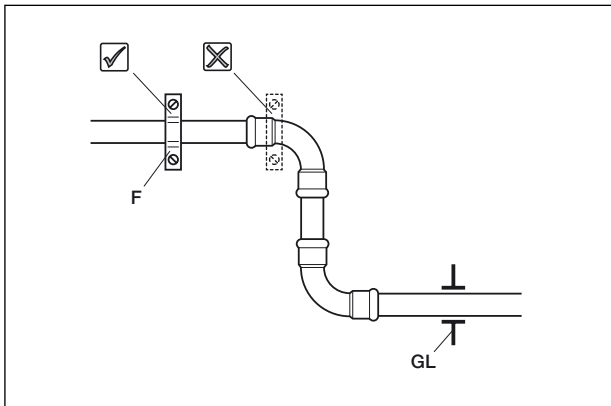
Positioning anchor points: On the pipe, not on the pressfitting
